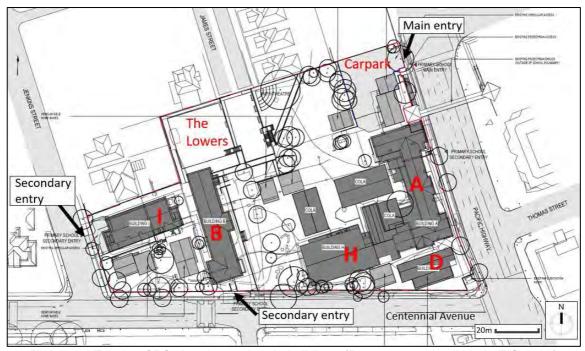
| Existing CPS site plan and main buildings (Base source: Applicant's EIS 2020)
